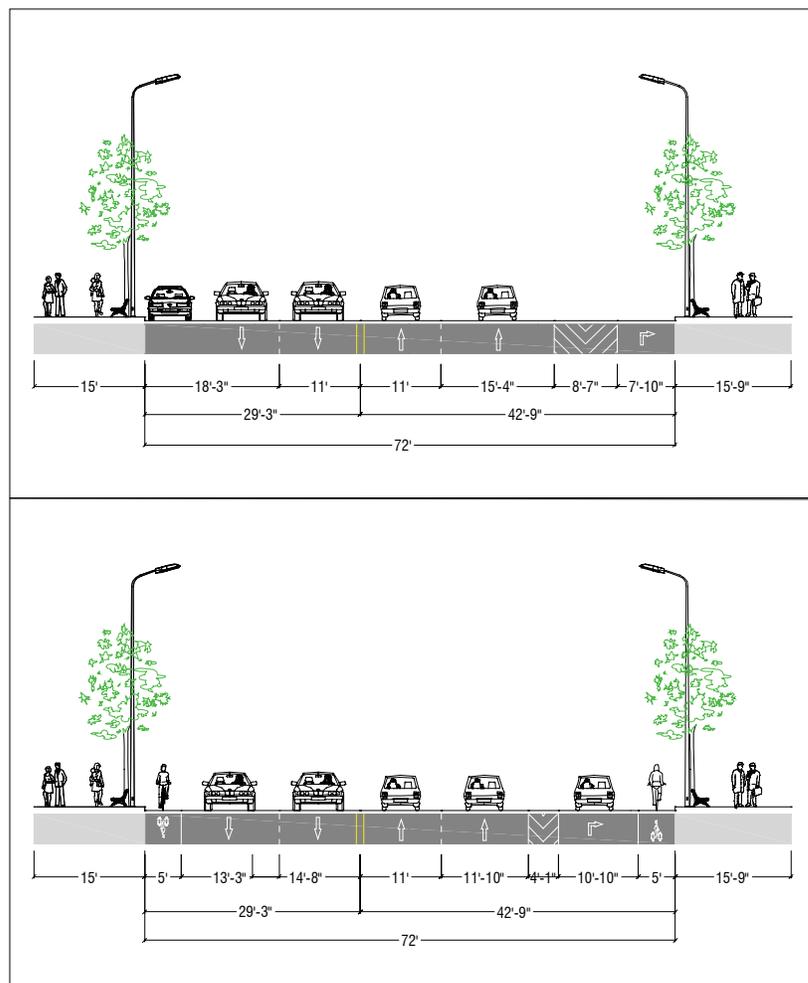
Bruckner Boulevard at Lincoln Avenue, existing and recommended cross section (facing west)
